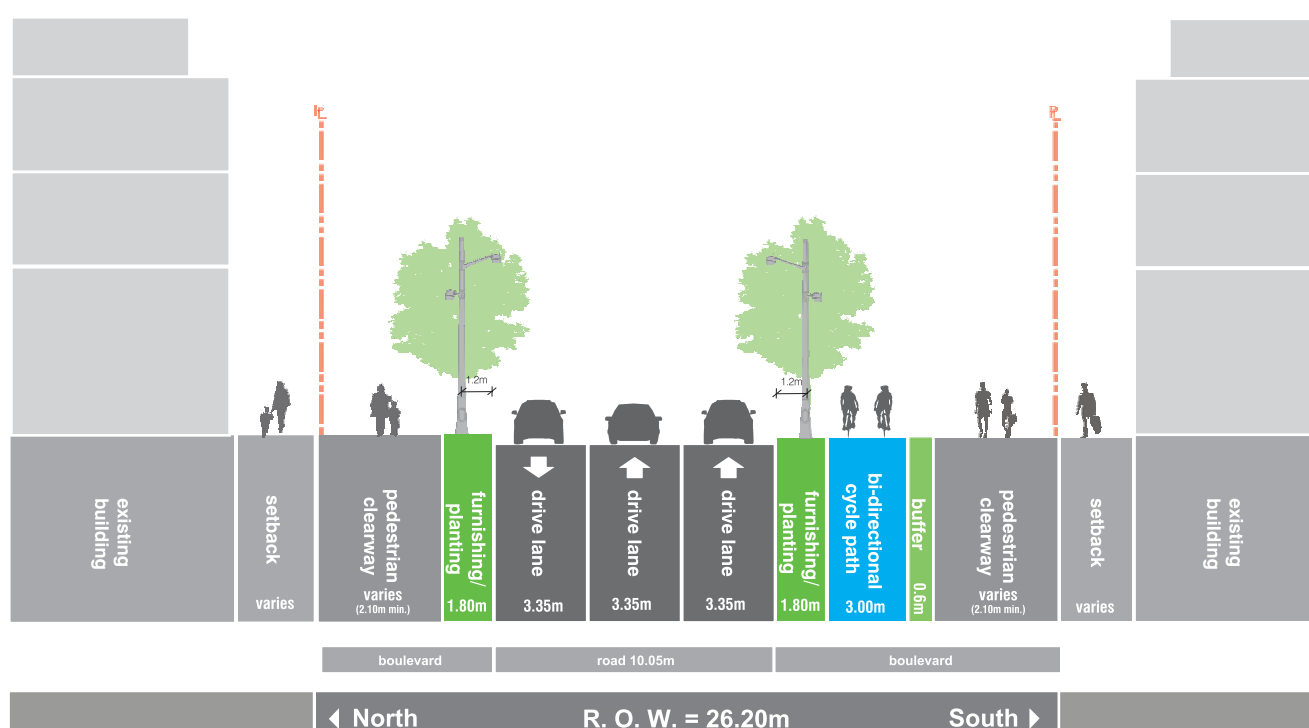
Harbour Street - Bay Street to Yonge Street Evaluation of Alternatives
